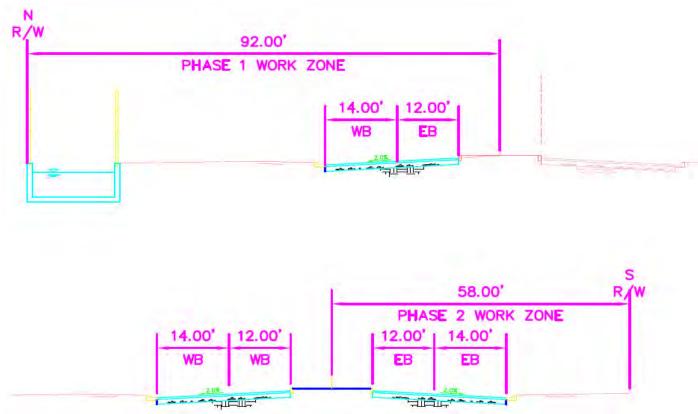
Phased Construction of Grace Neal Parkway. (Looking East. NTS)
